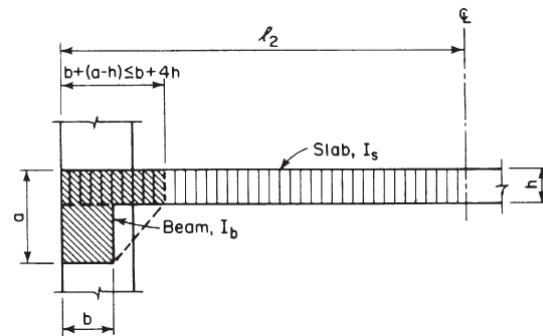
Effective Beam and Slab Sections (Edge Beam)
